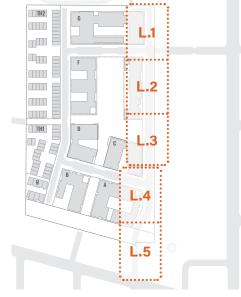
Lee Avenue, Section 1 \*See Figure 5.13–2: Lee Avenue, Site Plan Enlargement L.1.
